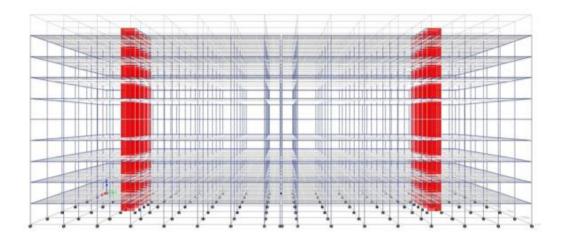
Elevation View of G+9 Structure of 90m slab length with expansion joint.
